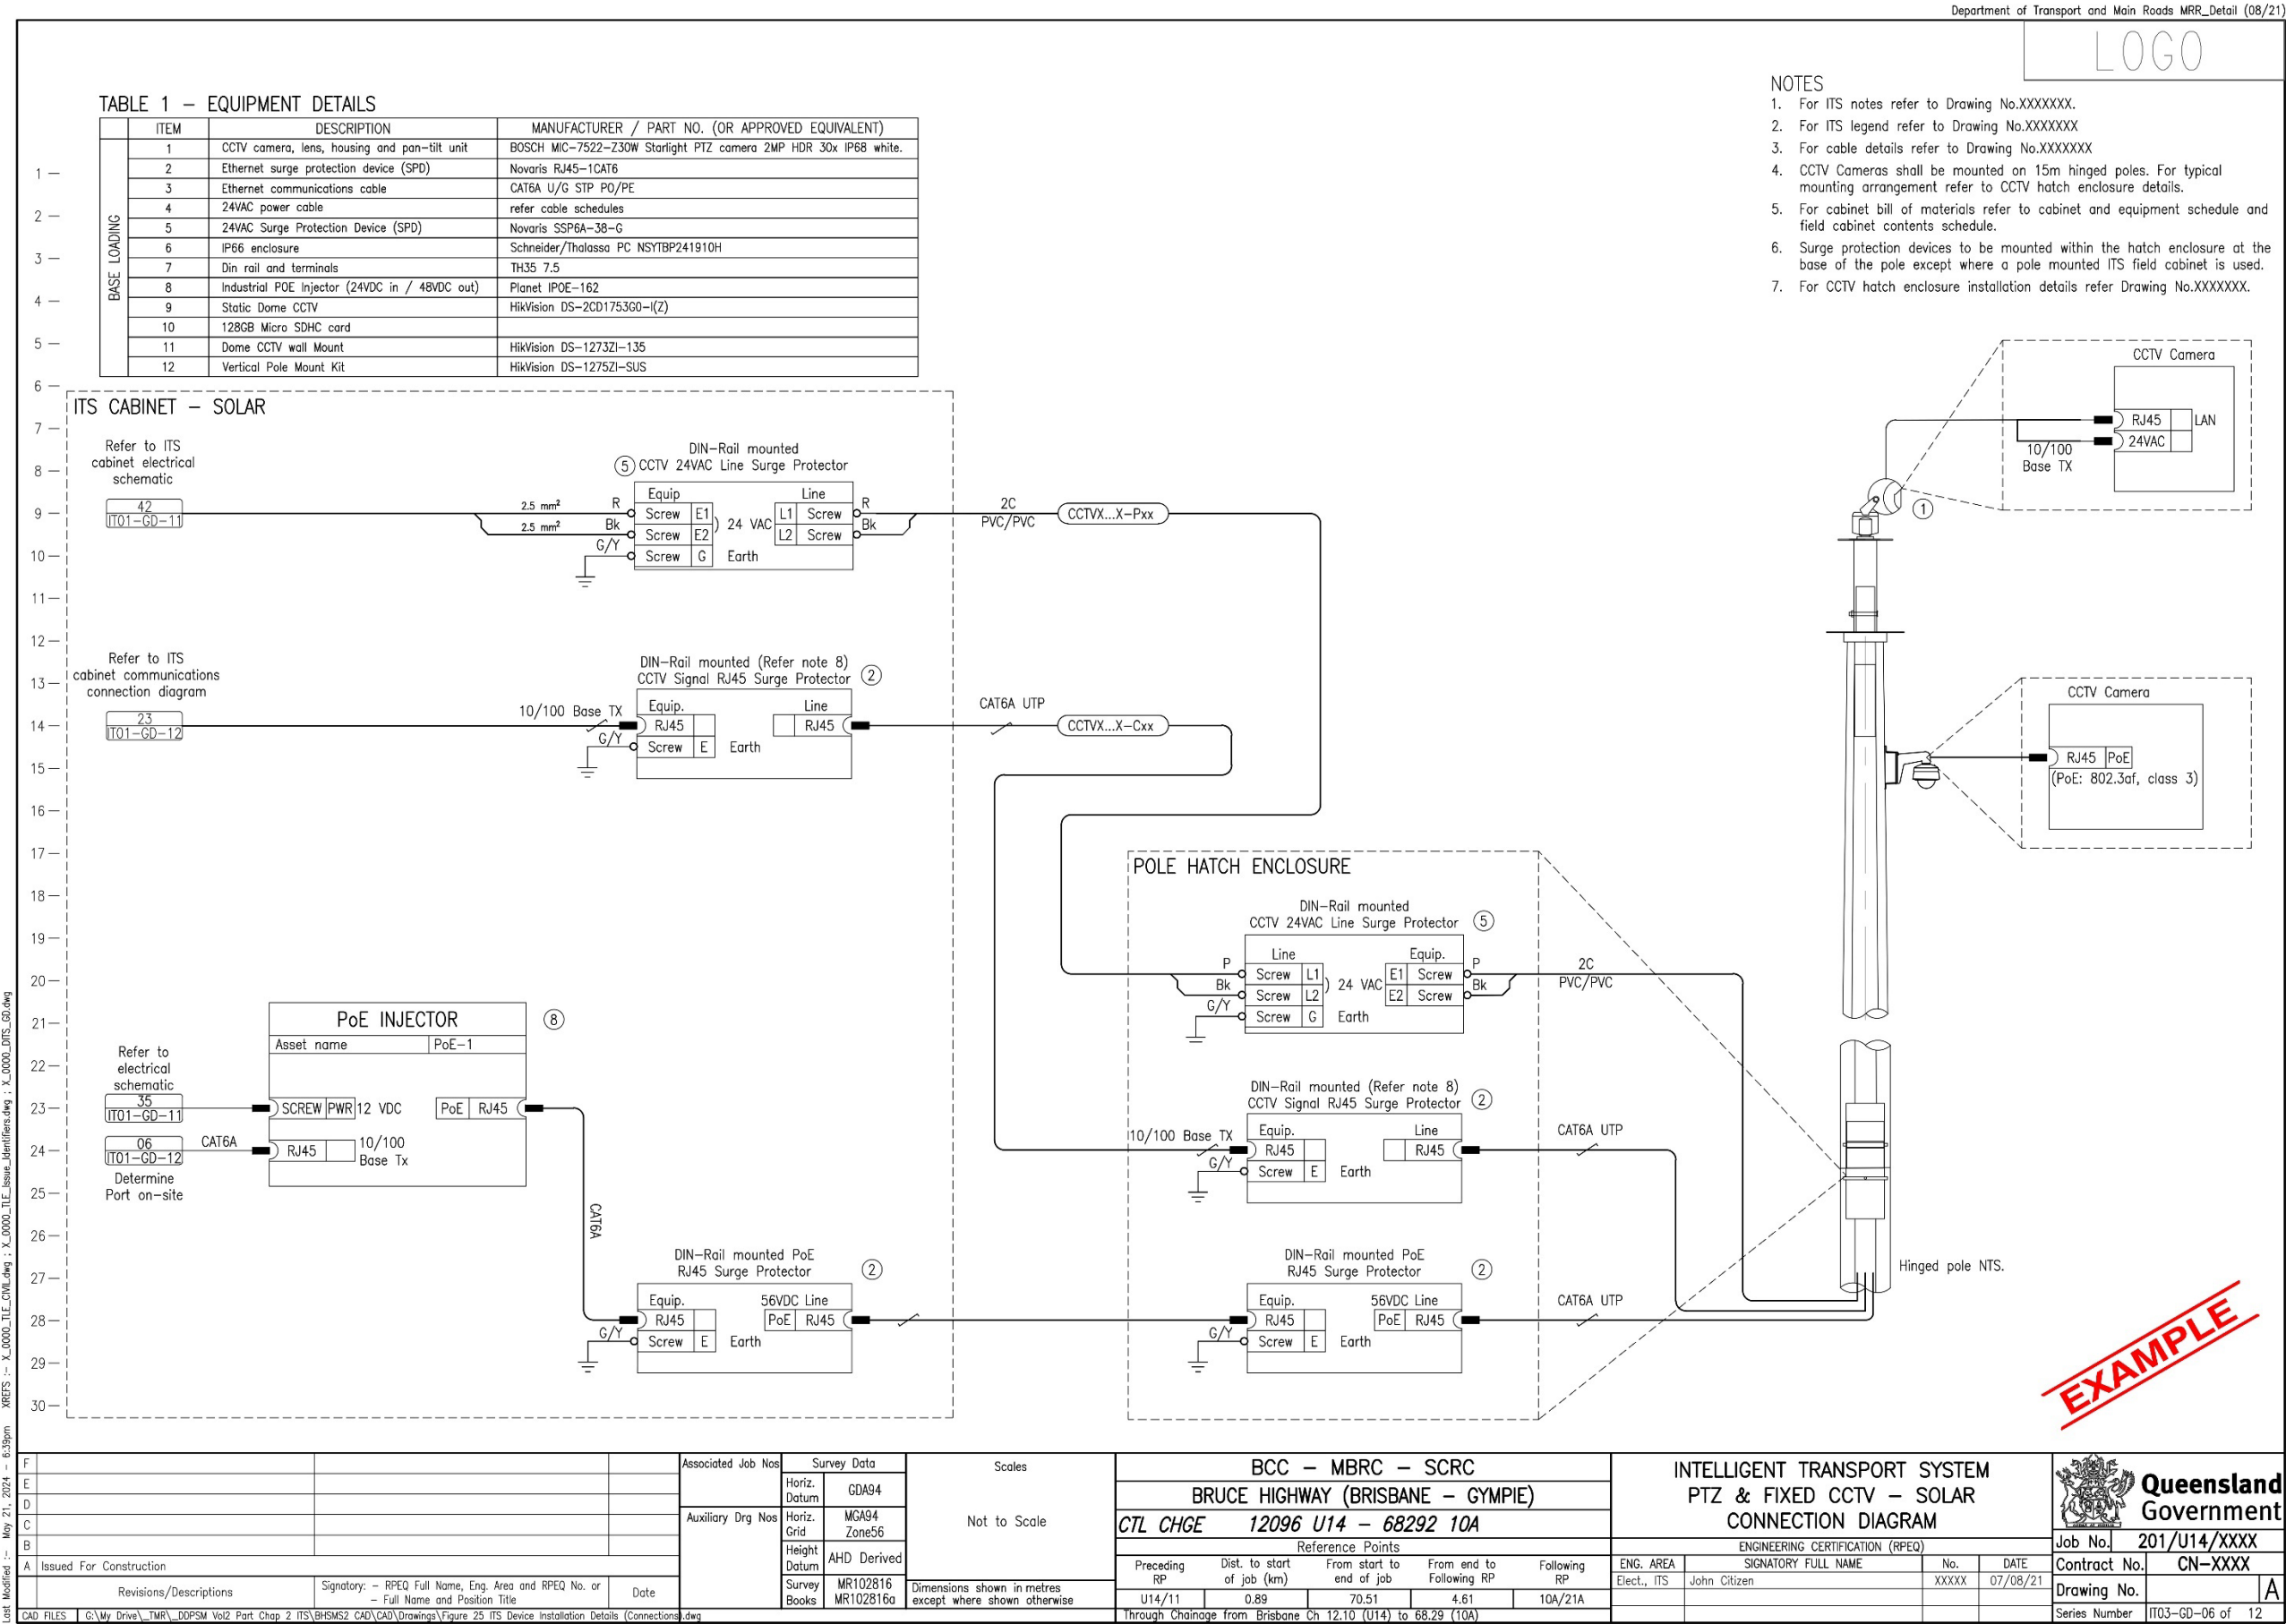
(b) – CCTV installation detail showing connections (example)
